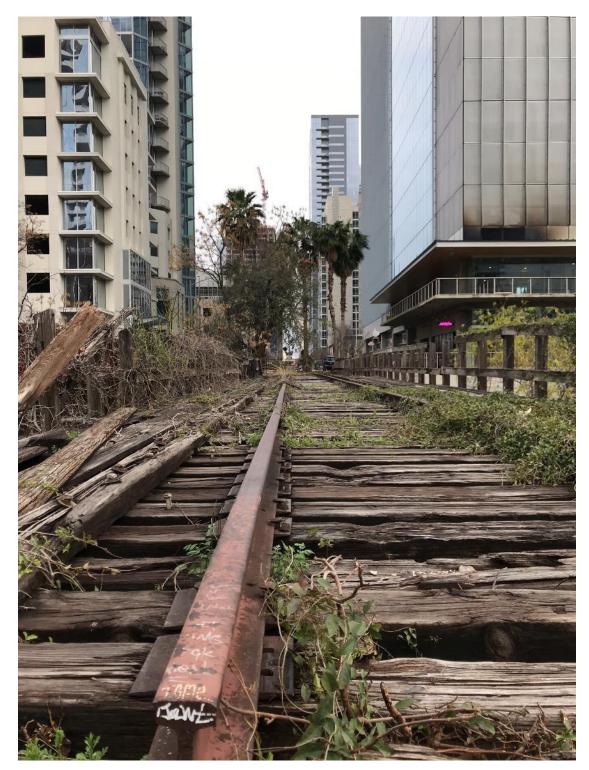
Third Street Railroad Trestle railing detail, camera facing south. Photo by Joemy Buschur.
